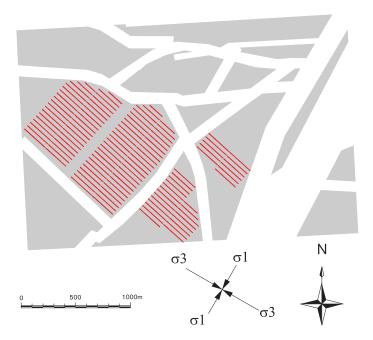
Repository layout for Ceberg with deposition tunnels oriented perpendicular to the maximum horizontal stress; z = -500 m.
